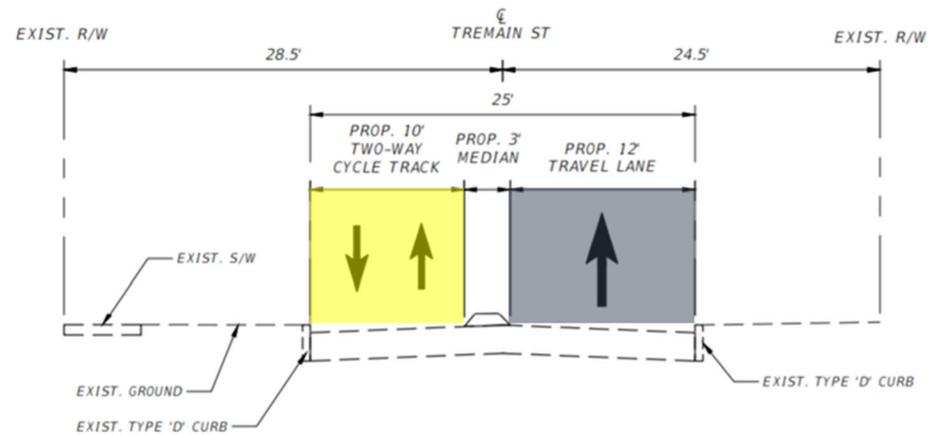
| Planning Concept A-1 Connector Alignment Typical Section D-D
